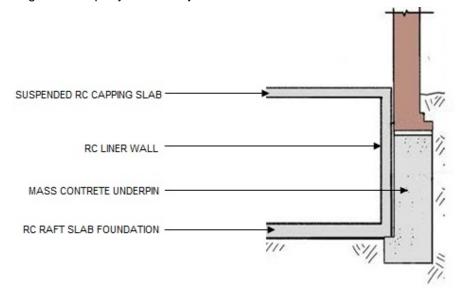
Sketch Section Indicating Typical East/West Section through Basement
